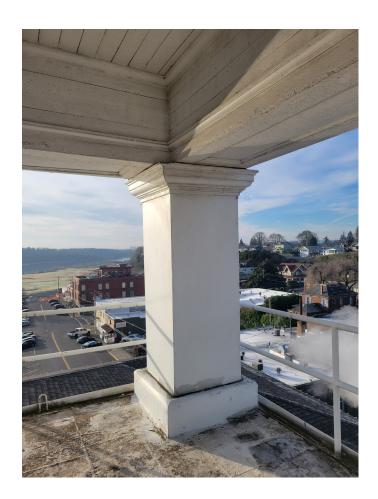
PHOTOS OF THE DETERIORATED BELL TOWER CEILING
